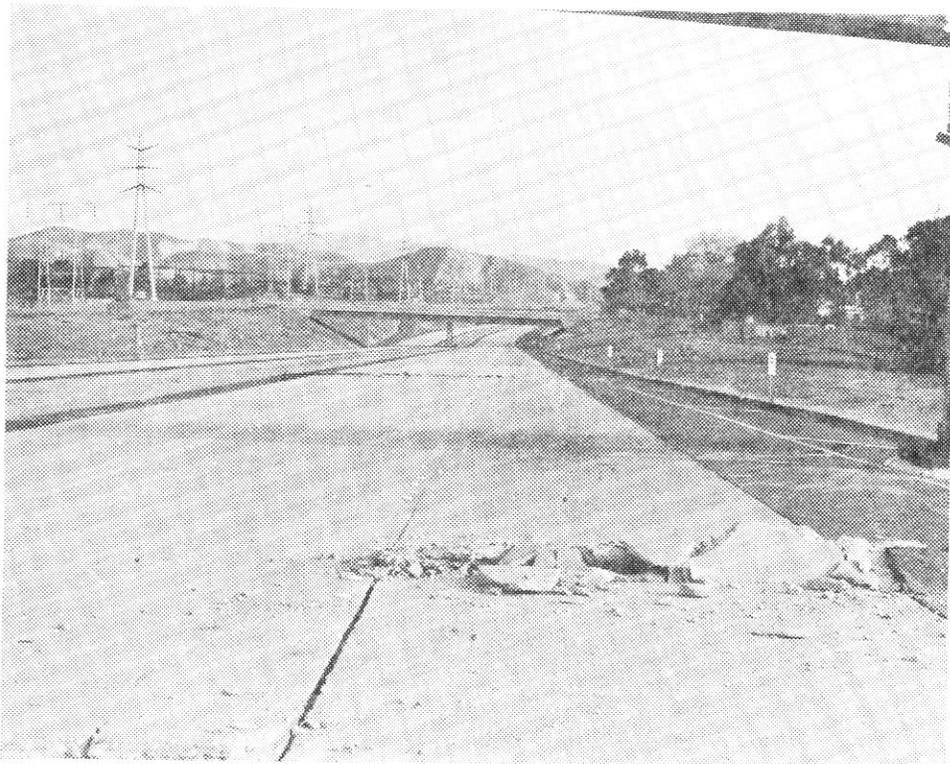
Looking east at compression features in pavement slabs. Note spalling occurred only in one lane.
